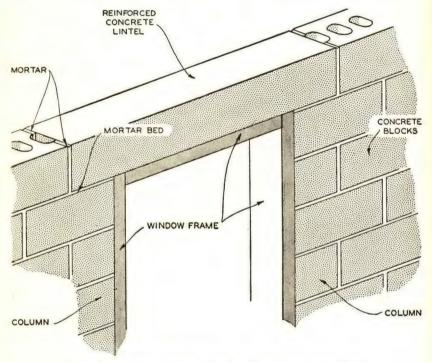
Precast Concrete Lintel in Place over Window Frame
